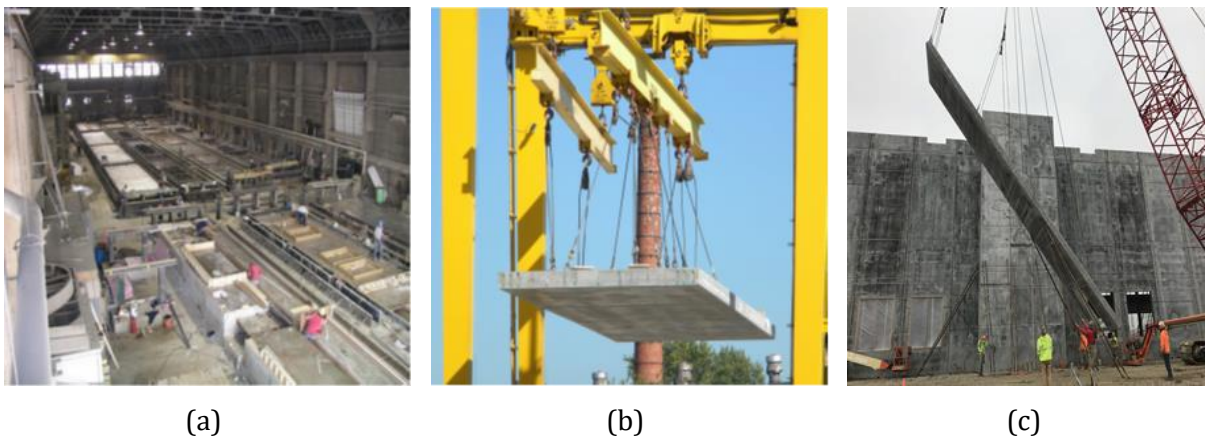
Step-by-step process of precast concrete sandwich wall panel construction: (a) casting the panel in the factory, (b) lifting and handling in the yard, and (c) installation at the construction site [31]
